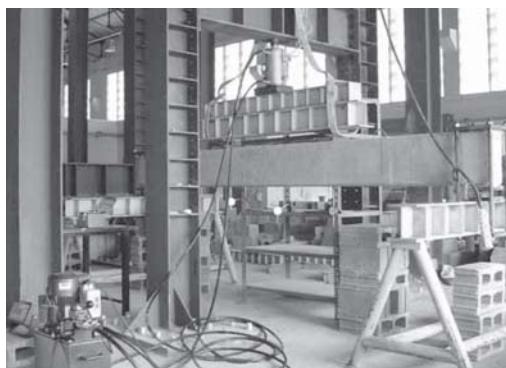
Four-point loading test set-up for the precast reinforced concrete beams
